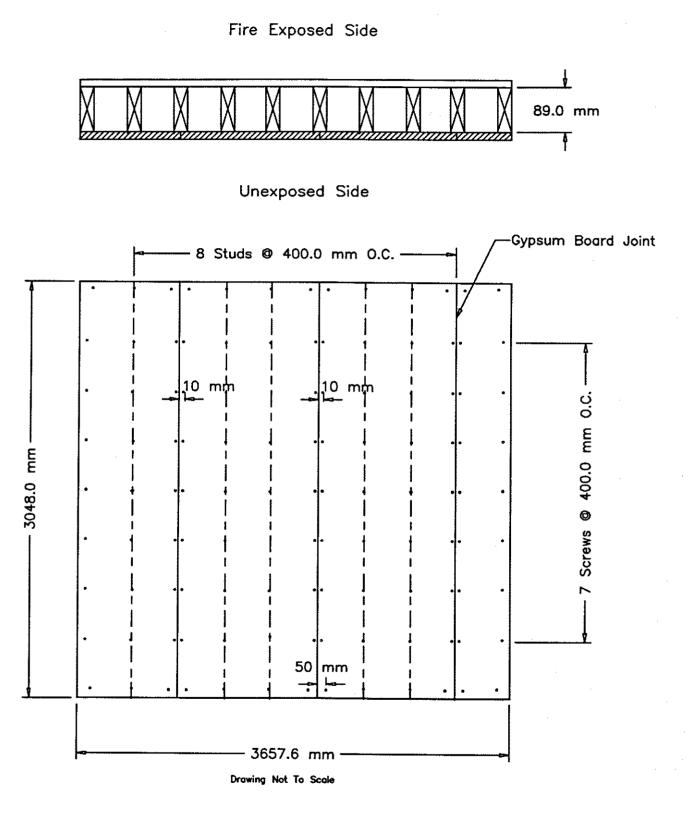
Screw Locations For Wood Stud, 1x1 Gypsum Board Layers, Full-Scale Assembly, Base Layer Gypsum Board, Unexposed Face
